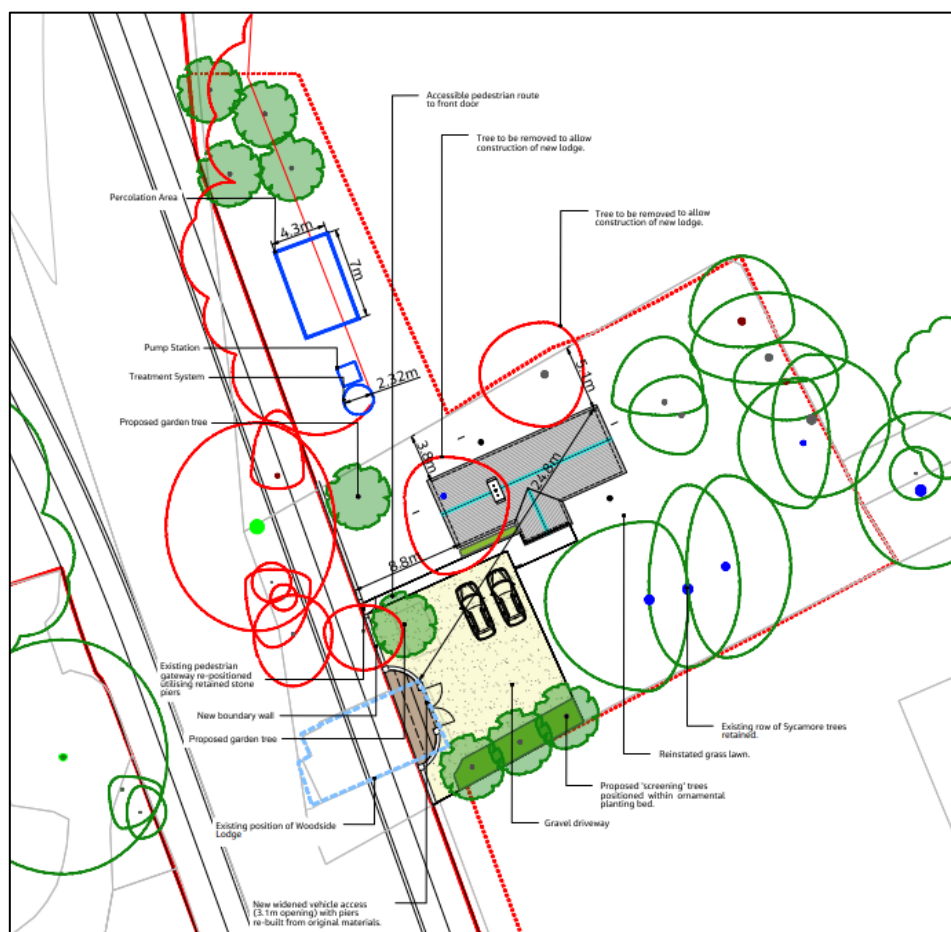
Extract from Proposed Woodbrook Side Lodge General Arrangement Drawing
